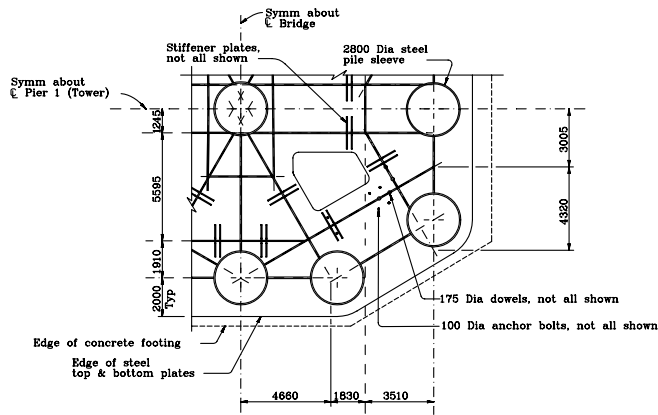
Partial Plan View of the Tower Pile Cap Steel Frame
